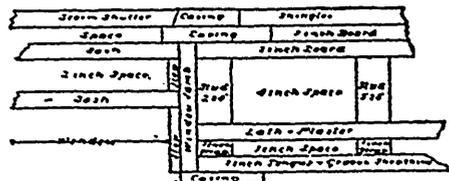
SECTION THROUGH WALL AND WINDOW.
